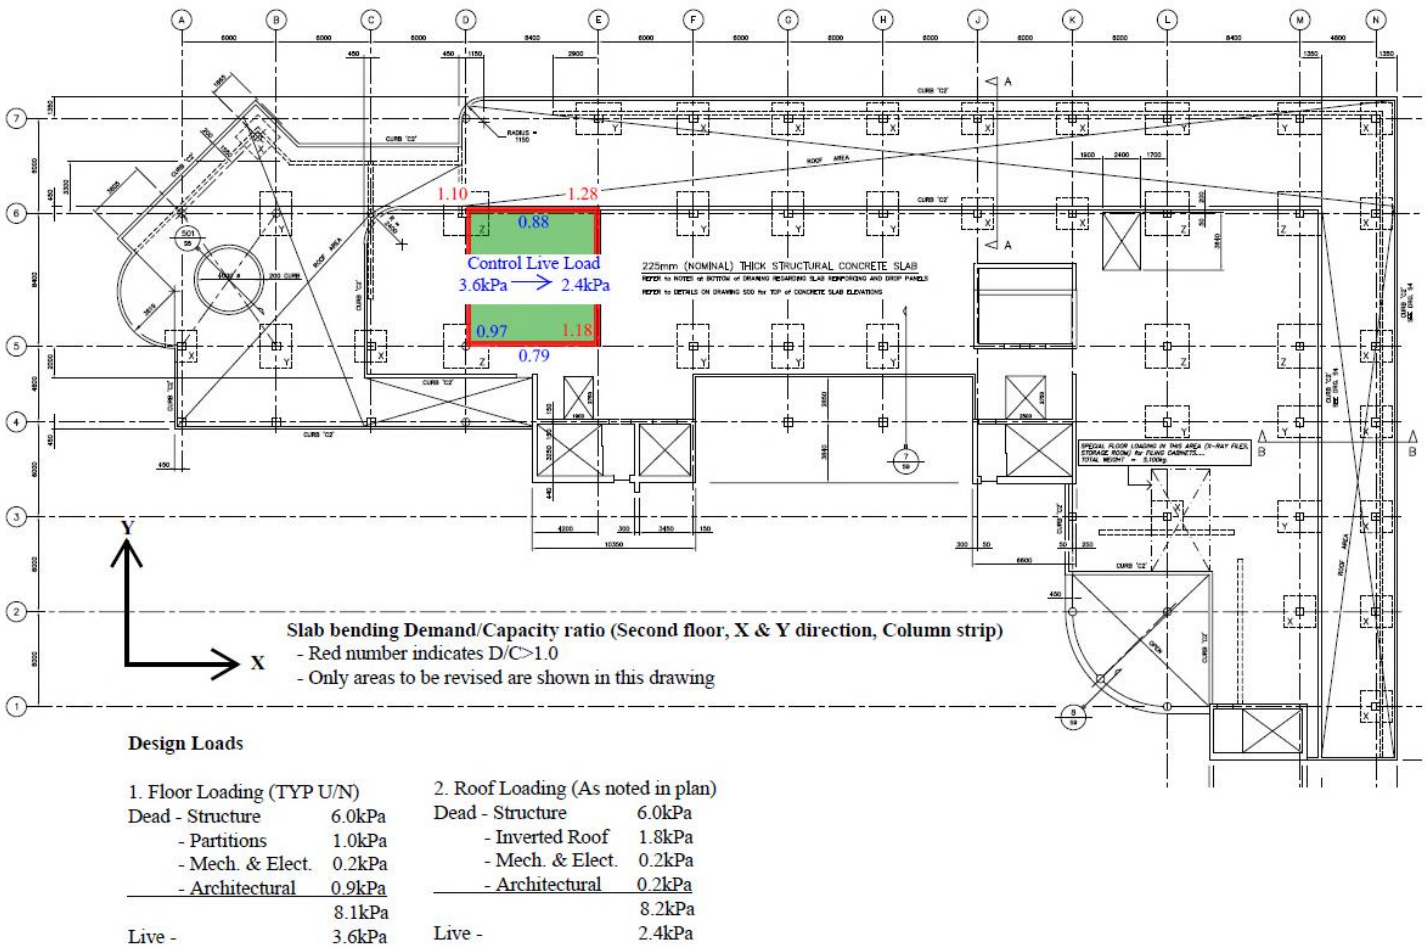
Slab bending D/C ratios (Second floor, X and Y directions, Column strip)
